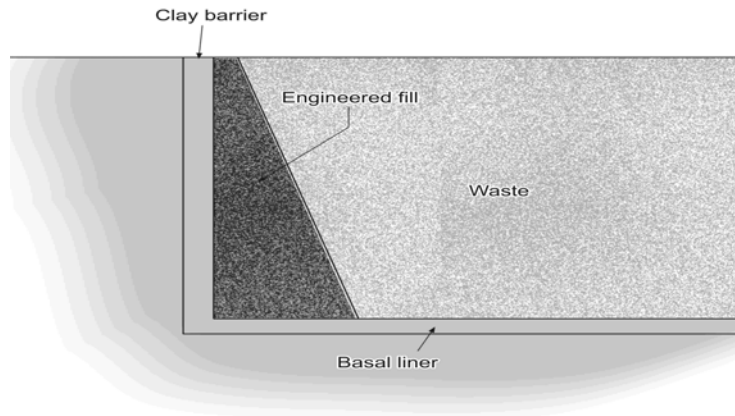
Cross-section through a mineral lining system supported by engineered fill
